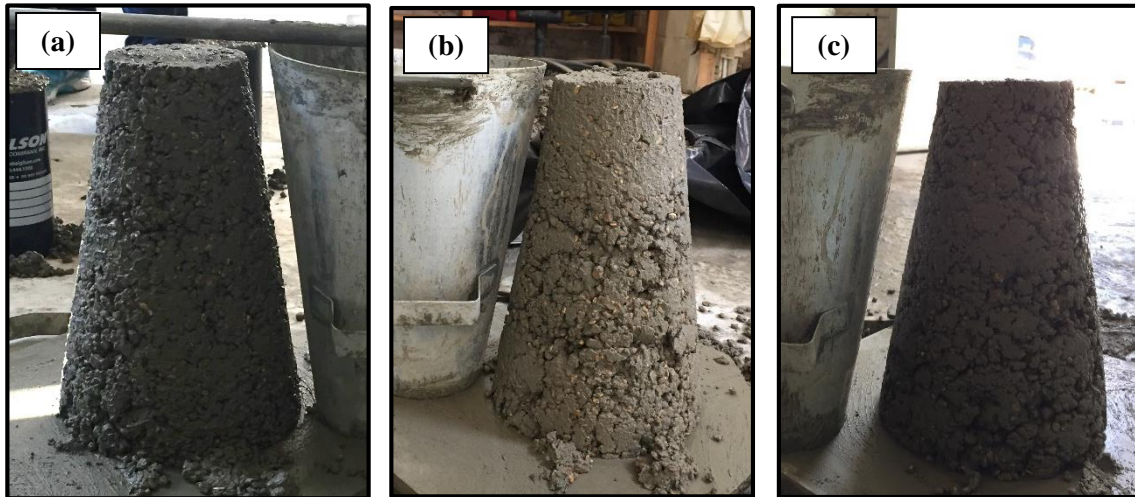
Air Pockets in Slump Specimens (Mix 3)
